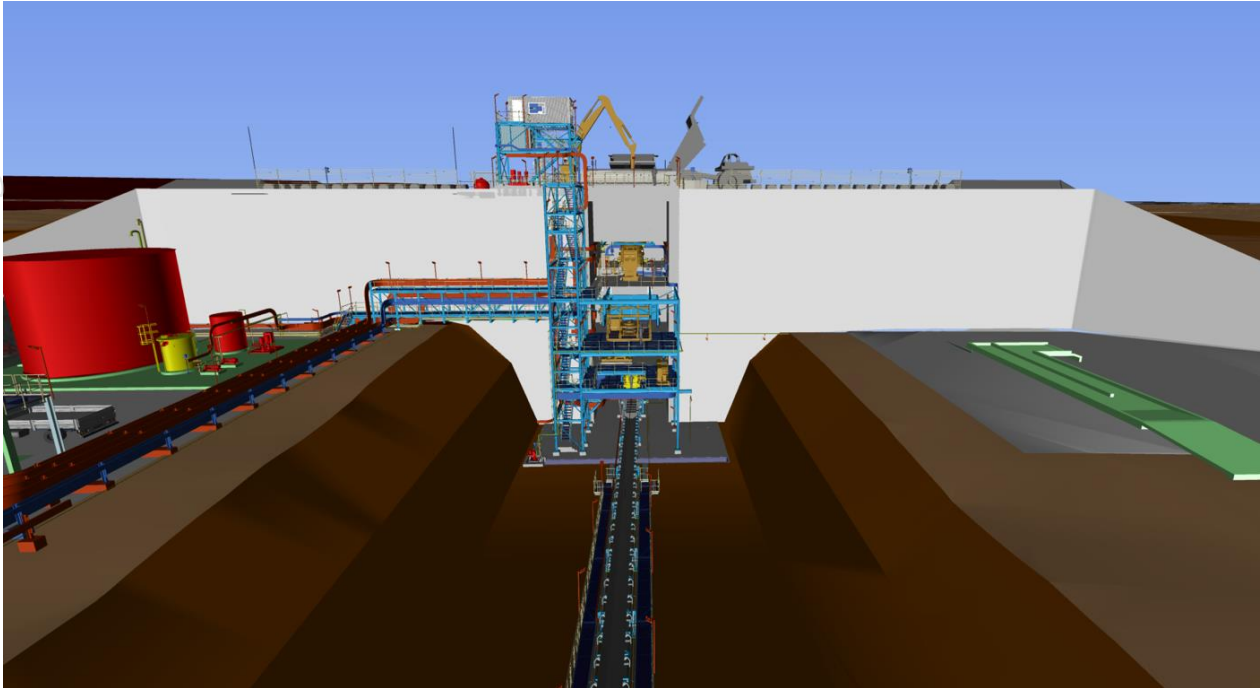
3D model of primary crushing building, retaining wall and surrounding area.
